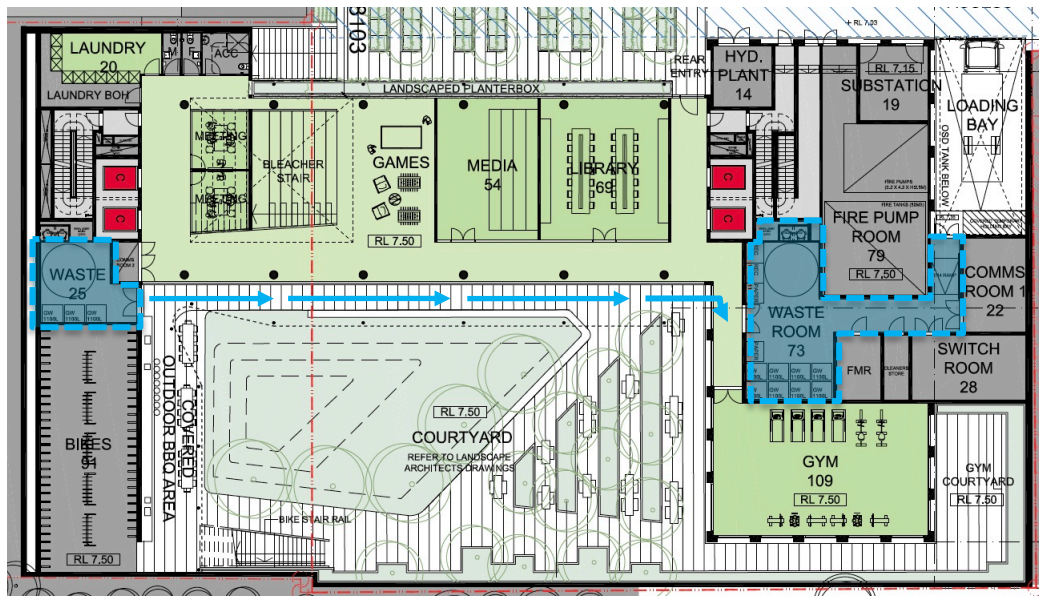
Location of Waste Rooms (highlighted in blue) and path of travel on Lower Ground Floor Plan (DA03.0G1, Rev B).
